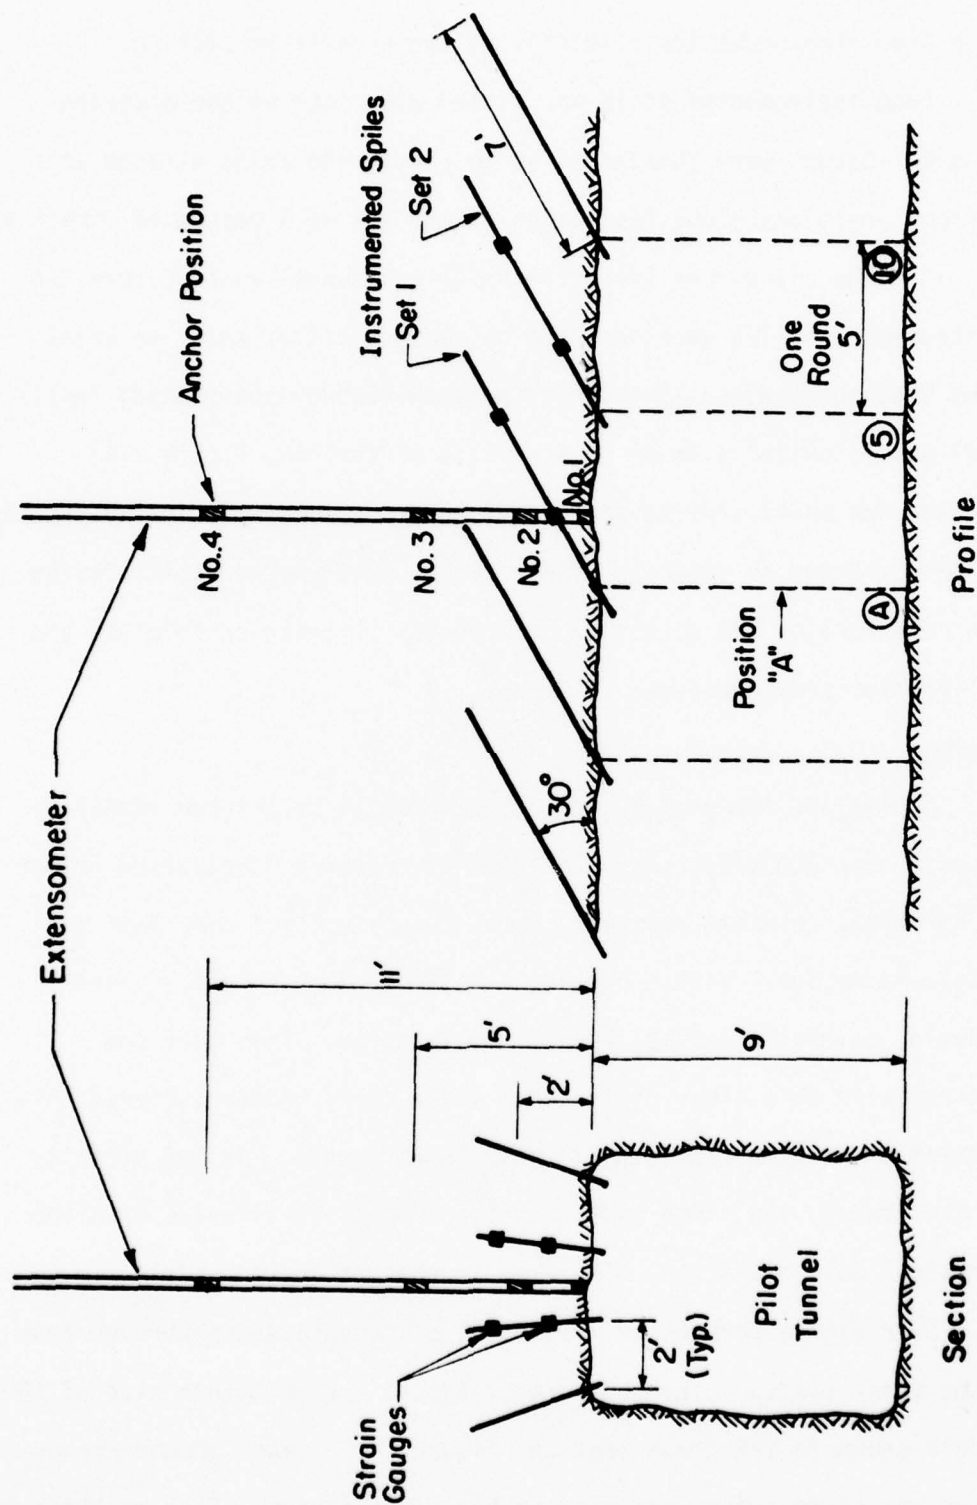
Section and Profile Vertical Projections of Test Station Instrumentation Layout
